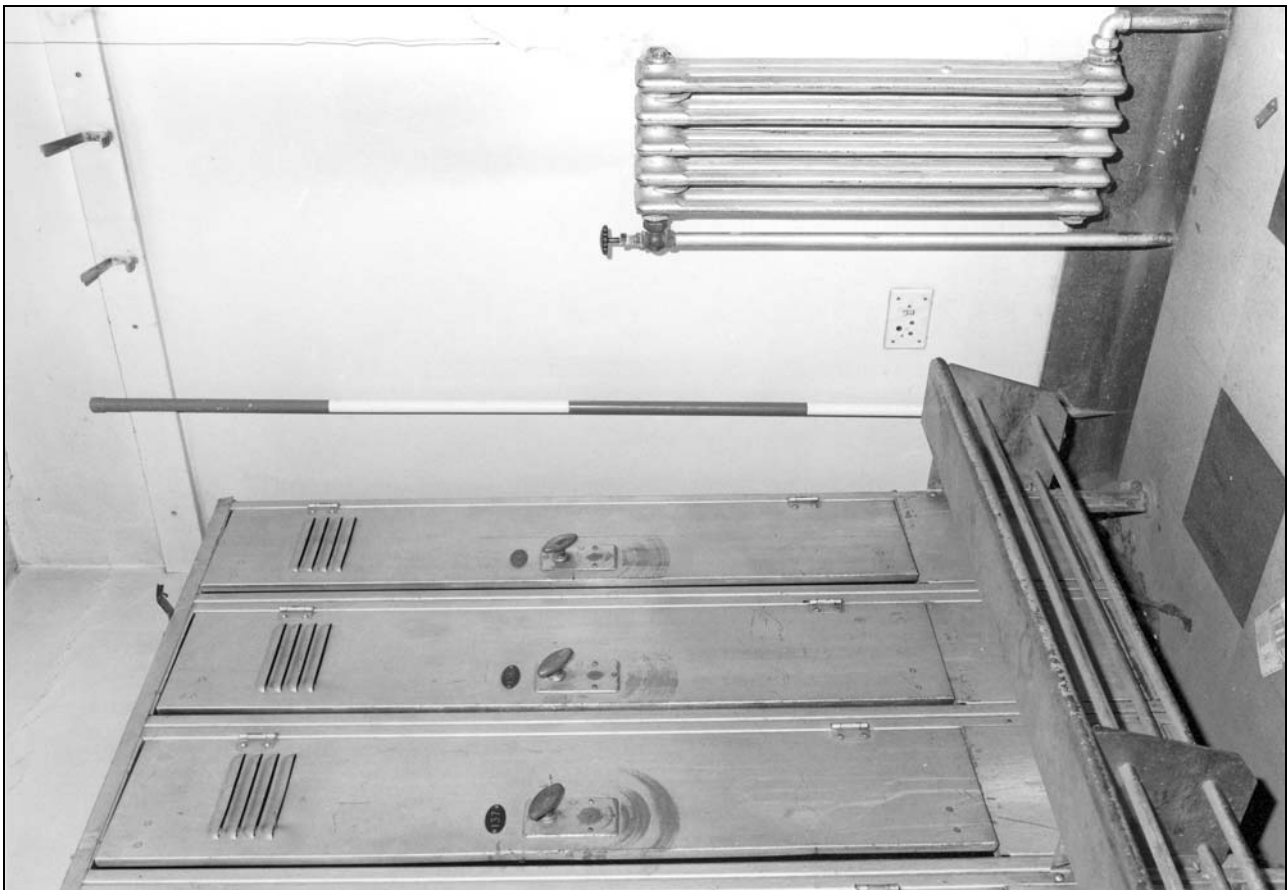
"Staff toilet", from the north-west (film 3, frame 16)
